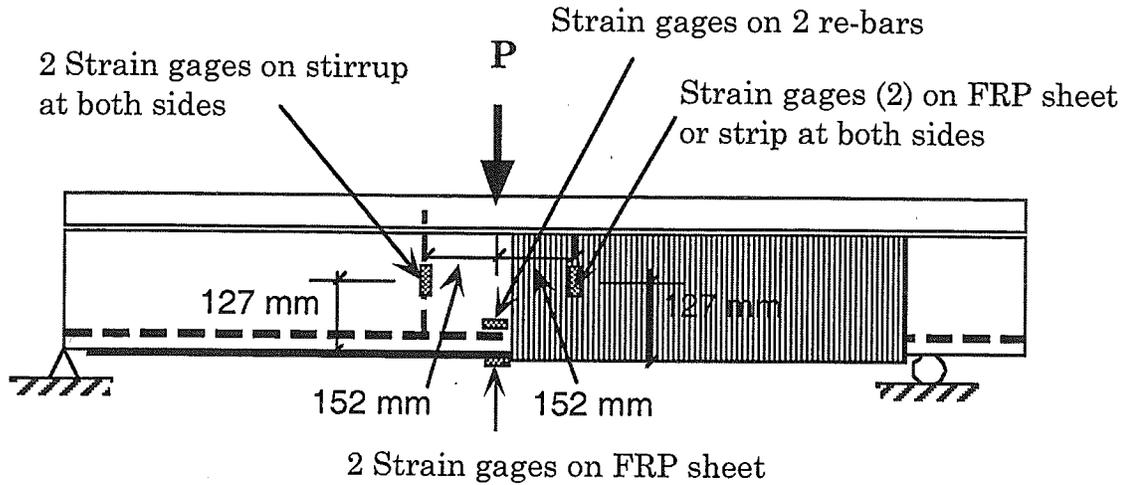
shows instrumentation layout for shear test. A computer data acquisition system (Megadack System) was used to measure the load and corresponding deflection as well as strains of longitudinal reinforcing bar, stirrup, and CFRP sheet or plate for flexural and shear strengthening.
